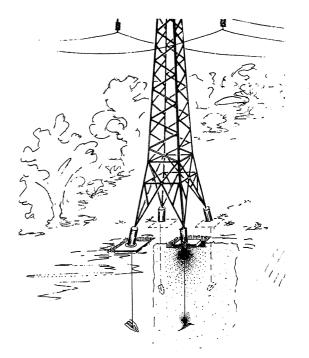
The pylon foundation is stabilized by the prestressing forces
